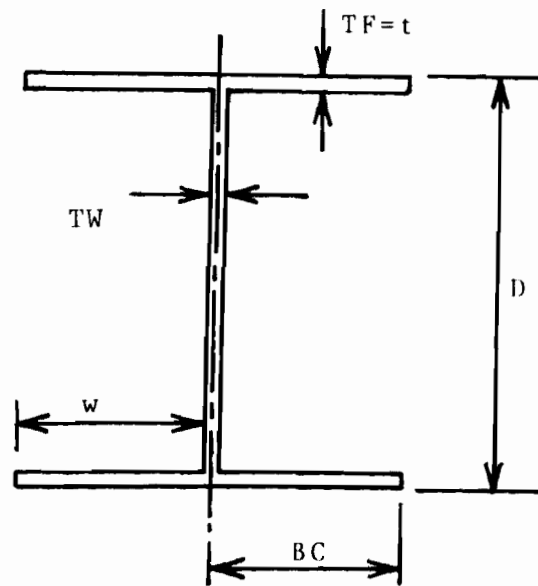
BIJLAARD AND FISHER'S SPECIMEN CROSS SECTION (Ref. 27)
